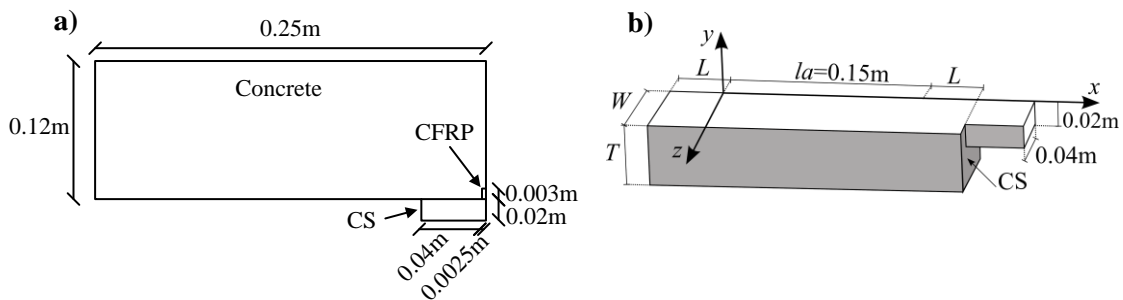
Geometry of the NSM flexurally strengthened slabs and CS protection: a) cross-section at midspan (in m); b) perspective of anchorage zone.
